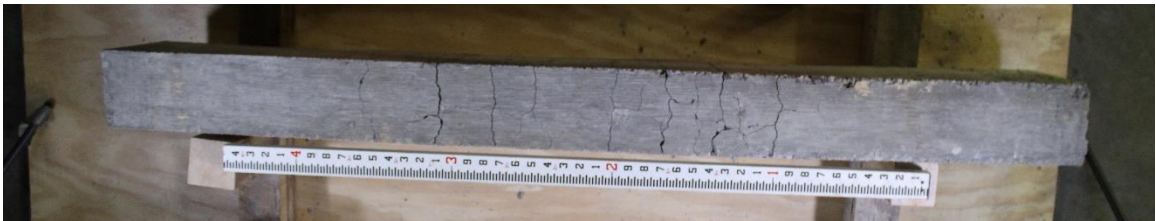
Mixture 7 (20W) beam #20: concrete beam bottom view.
